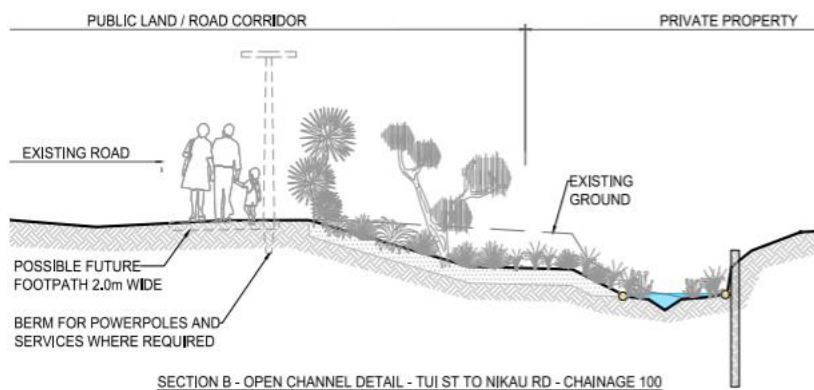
Cross Section of works at 11 Rata Street (Source: Healthy Waters, Appendix B)
